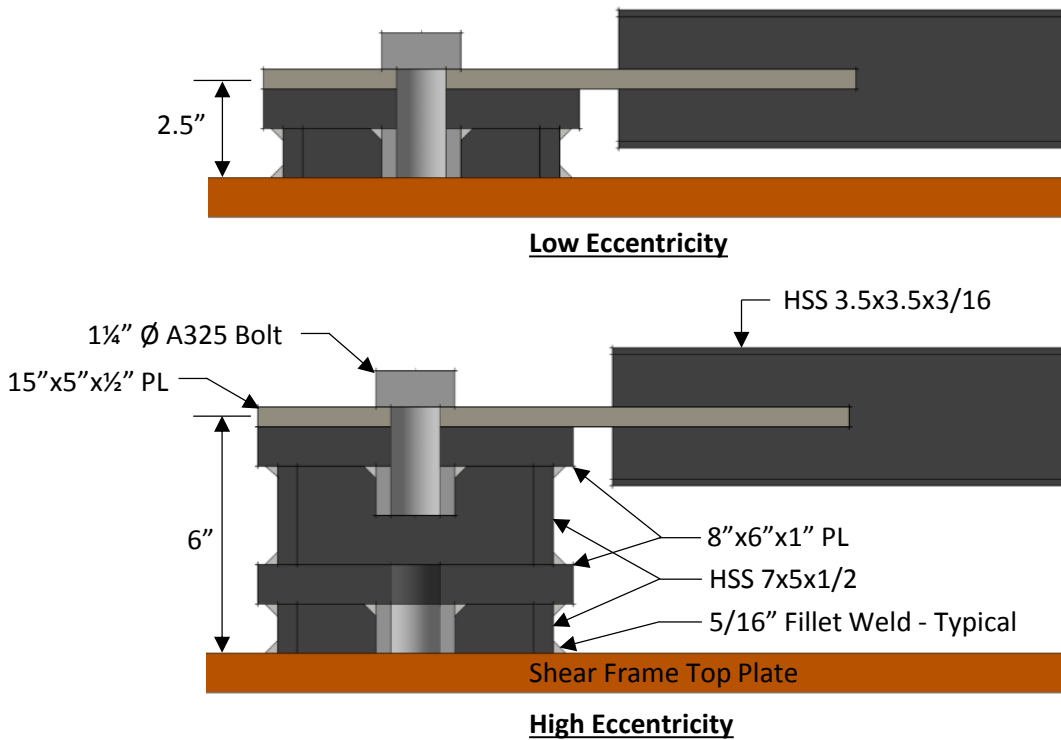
Cross-Frame to Shear Frame Connection – Cross-Section
